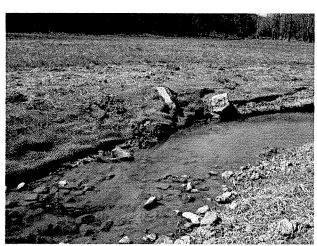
Looking downstream from rock J vane installed at LT Station 8+38. (9/27/04)
